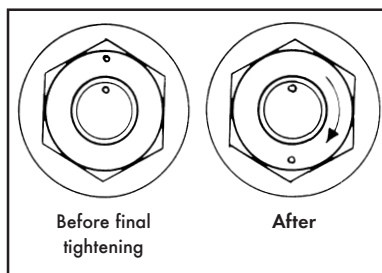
Where accurate tensioning is critical, permanent indication of the extent of part turn tightening can be identified by match marking.
